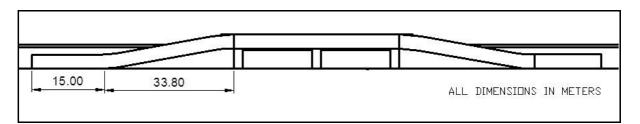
Side View Crossing Junction Switch Cover Dimensions
